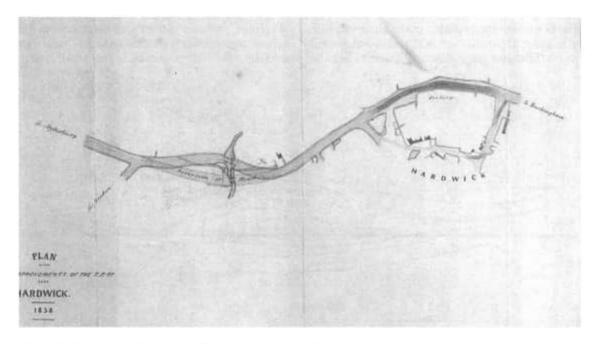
Hoppner's plan of the old bridge with a new bridge and connecting roads situated upstream. 1st February 1838. (BRO.T3/56/1). Reproduced courtesy Centre for Bucks Studies
